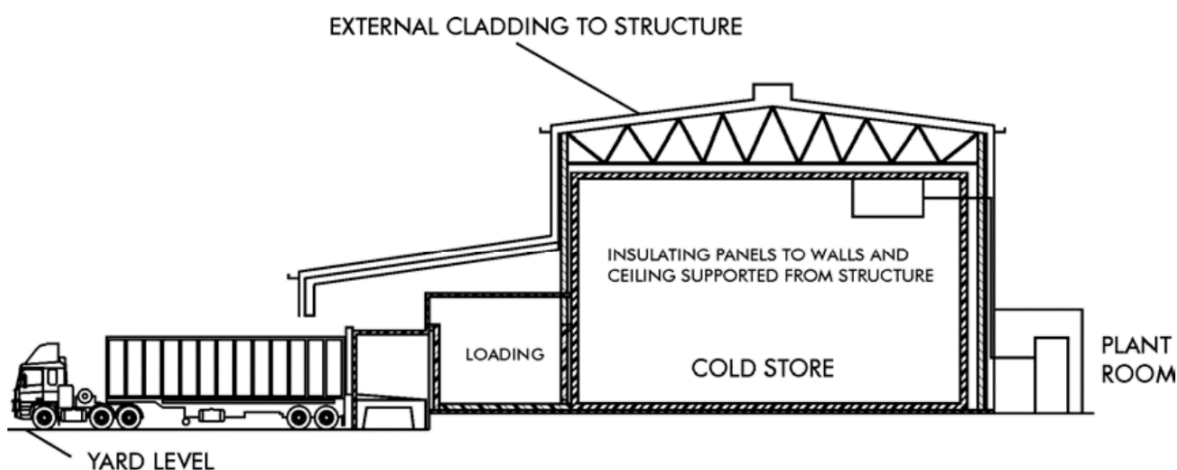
Internal insulation system with full external wall and roof cladding. (TPMA, 2006).
